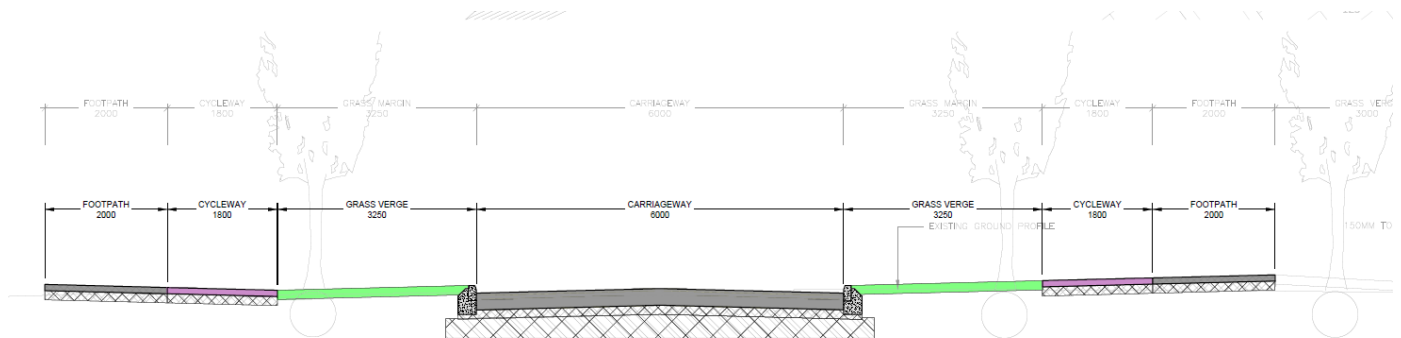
Typical Cross Section showing proposed footpath, cycle and road carriageway arrangement.
